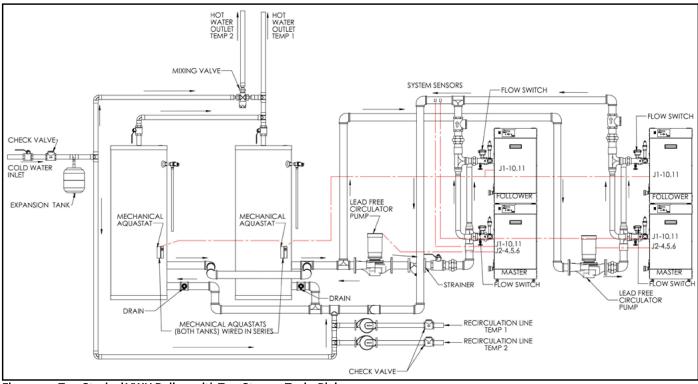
Two Stacked VWH Boilers with Two Storage Tanks Piping
